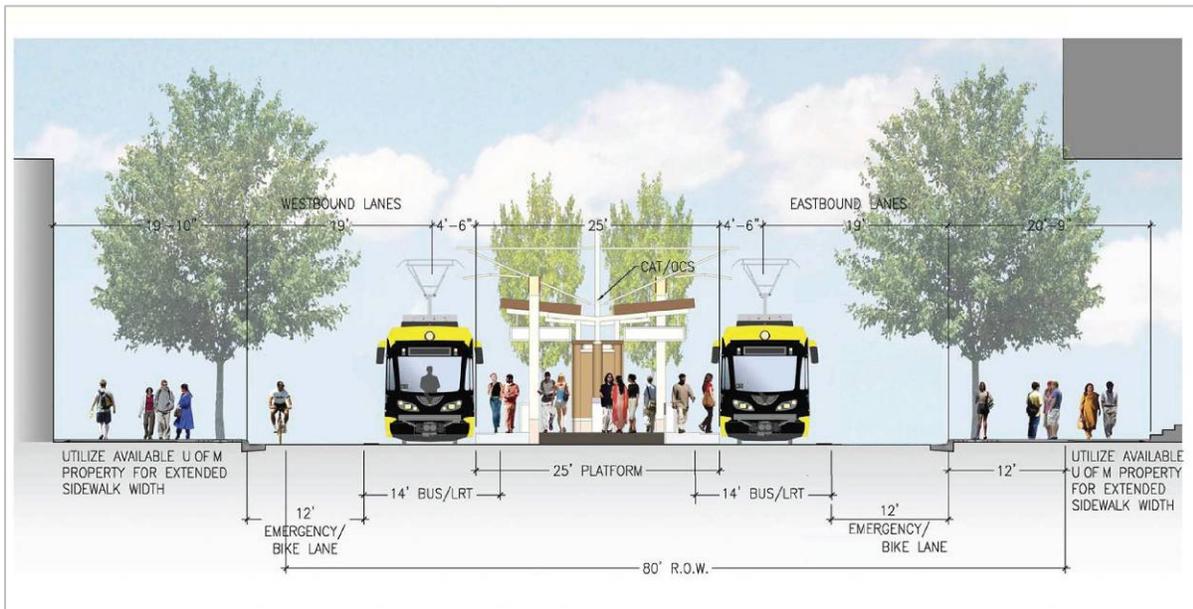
WASHINGTON AVENUE TRANSIT/PEDESTRIAN MALL TYPICAL CROSS SECTION
